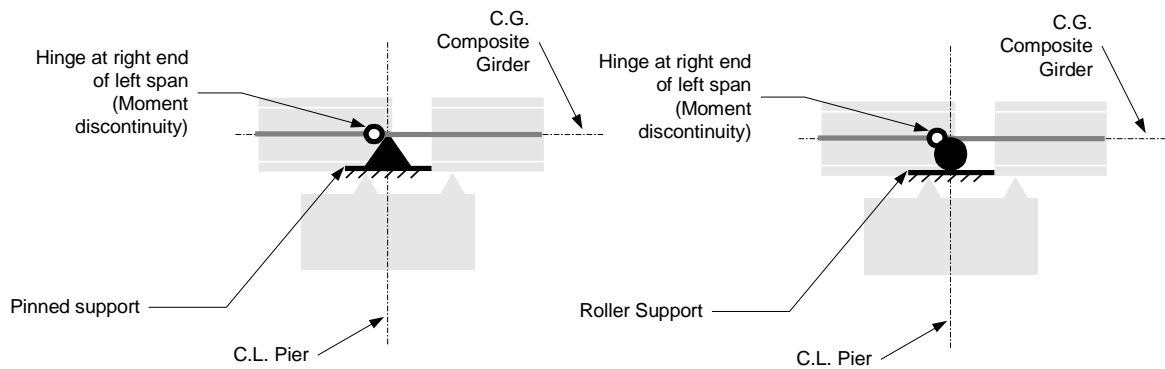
Simple Support Pier Connection on a Zero Height Idealized Pier
